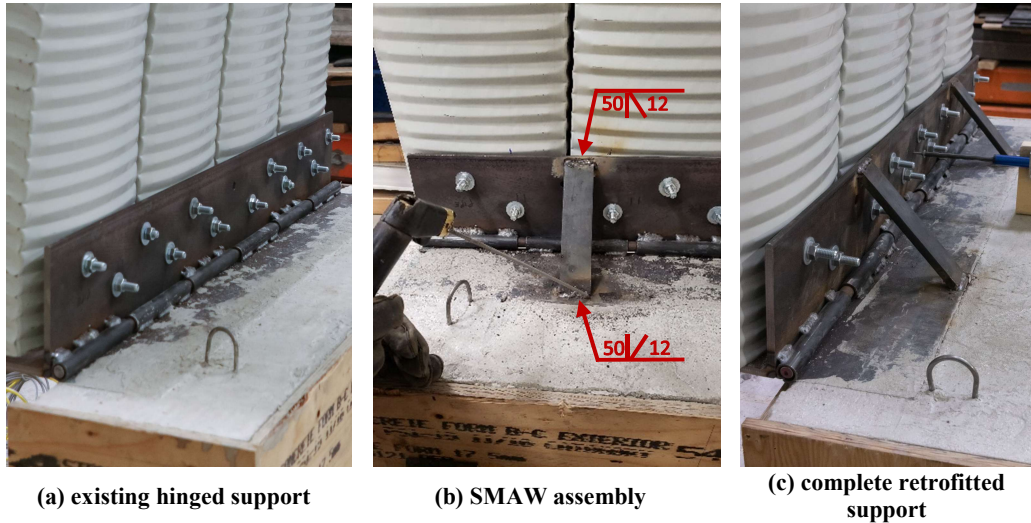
Hinged support stiffened via SMAW welding
